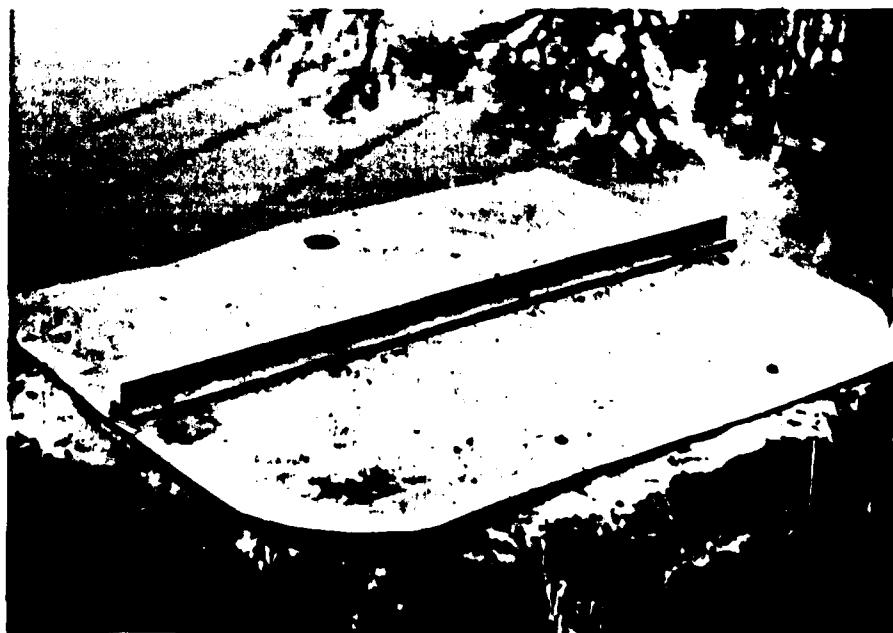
CLOSE-UP OF OUTLET WORKS CONTROL BOX
